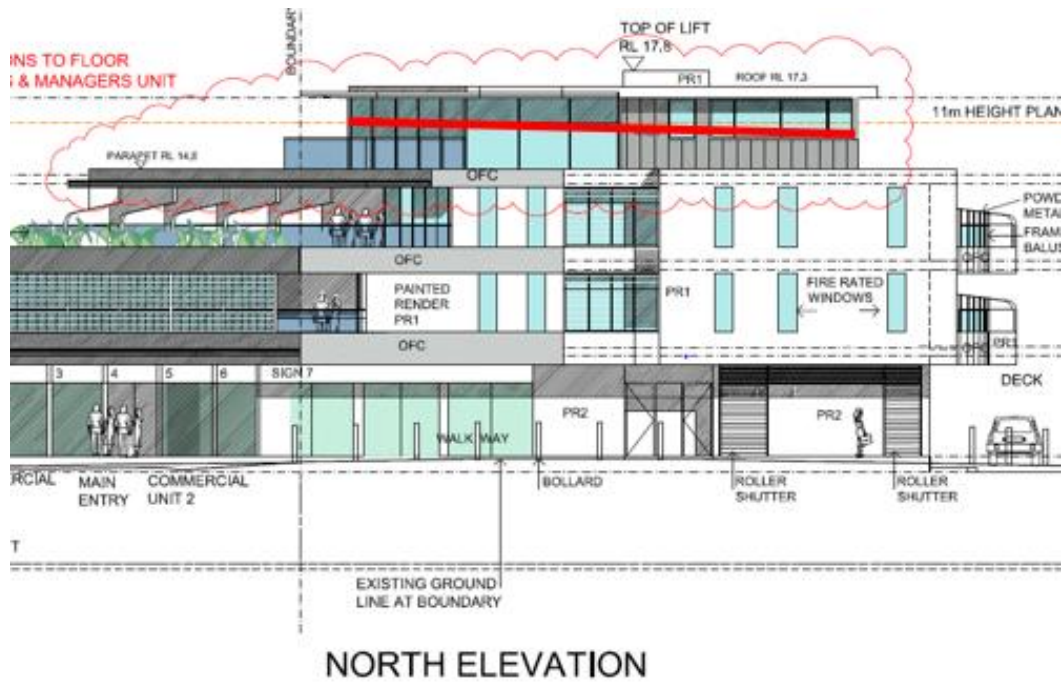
Plan extract showing extent of 11 metre building height breach as viewed from the north
